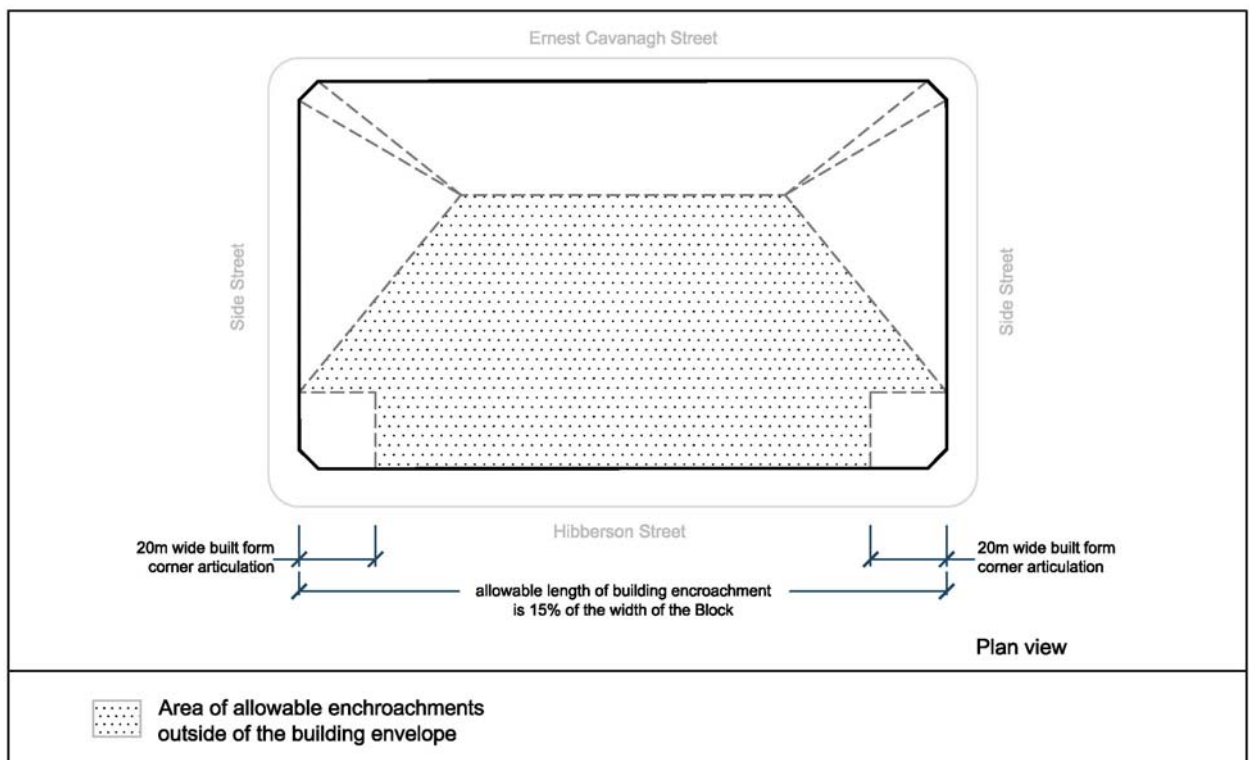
Building envelope in Precinct 1a (south side of Hibbersen Street)
